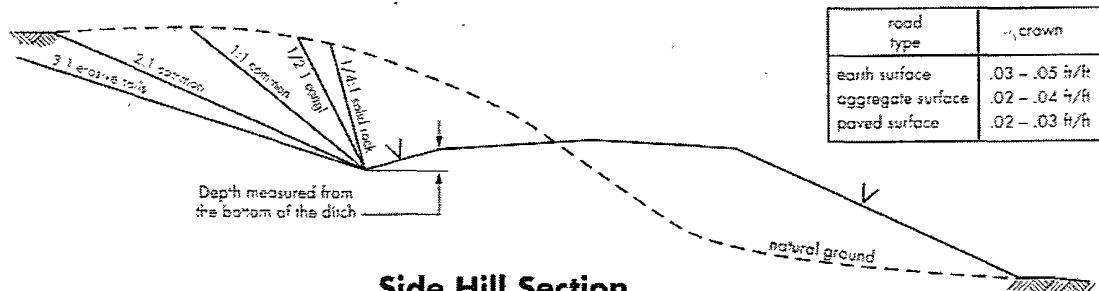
Cross Sections and Plans For Typical Road Sections
